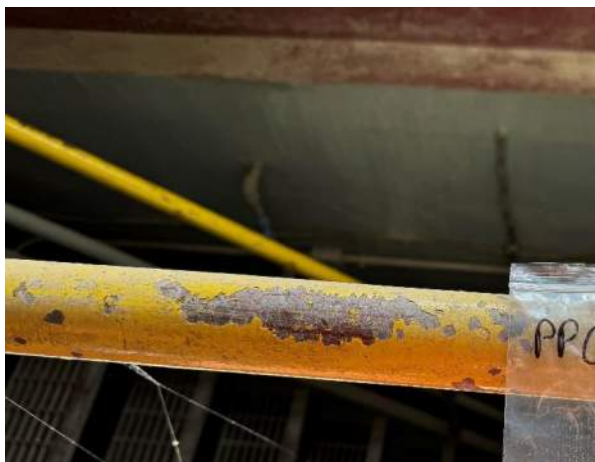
Sample PCC-1. Yellow lead-based paint on metal handrail.
